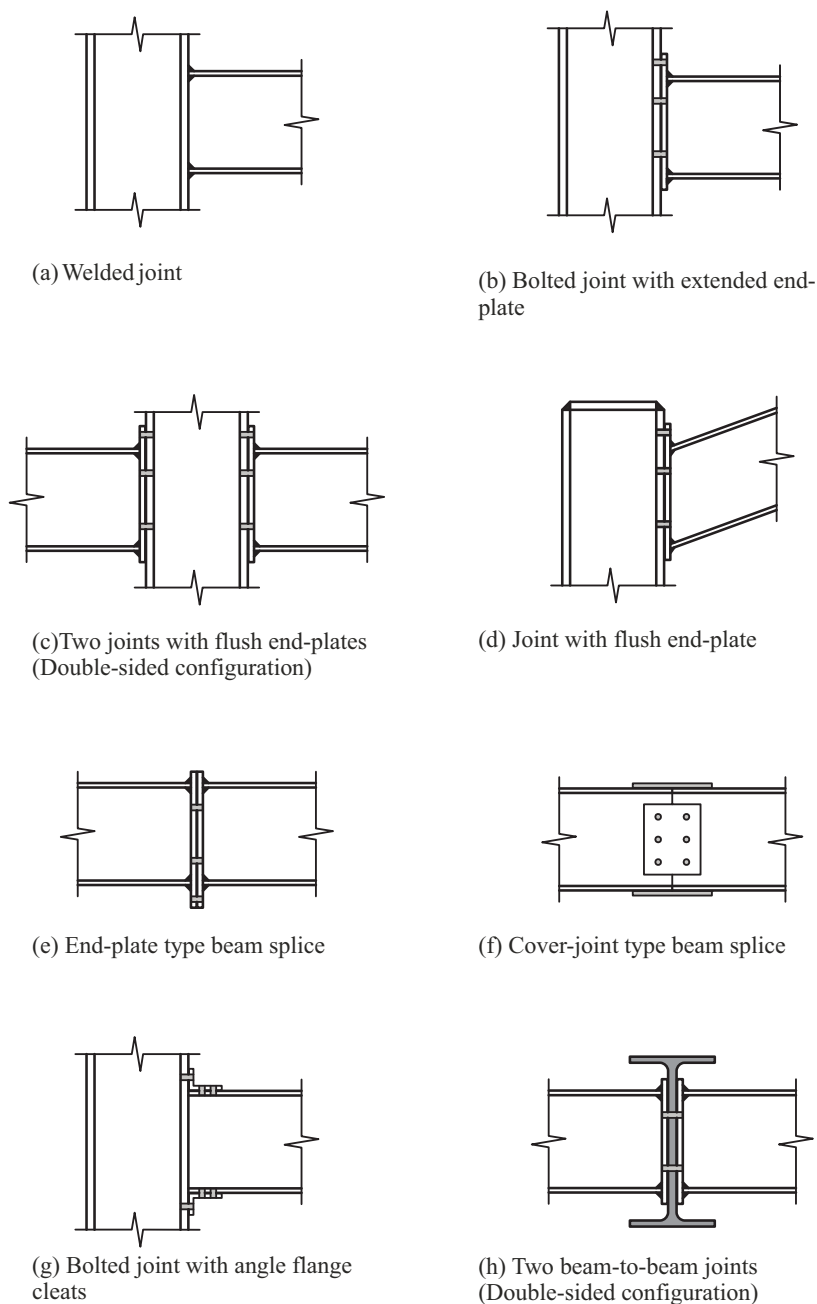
Examples of steel beam-to-column joints, beam-to-beam joints and beam splices joints covered by EN 1993-1-8
